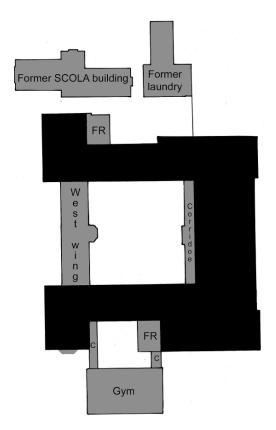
Sketch plan showing the Orphanage extensions shaded light grey. C = Corridor; FR = Block with flat roof.
